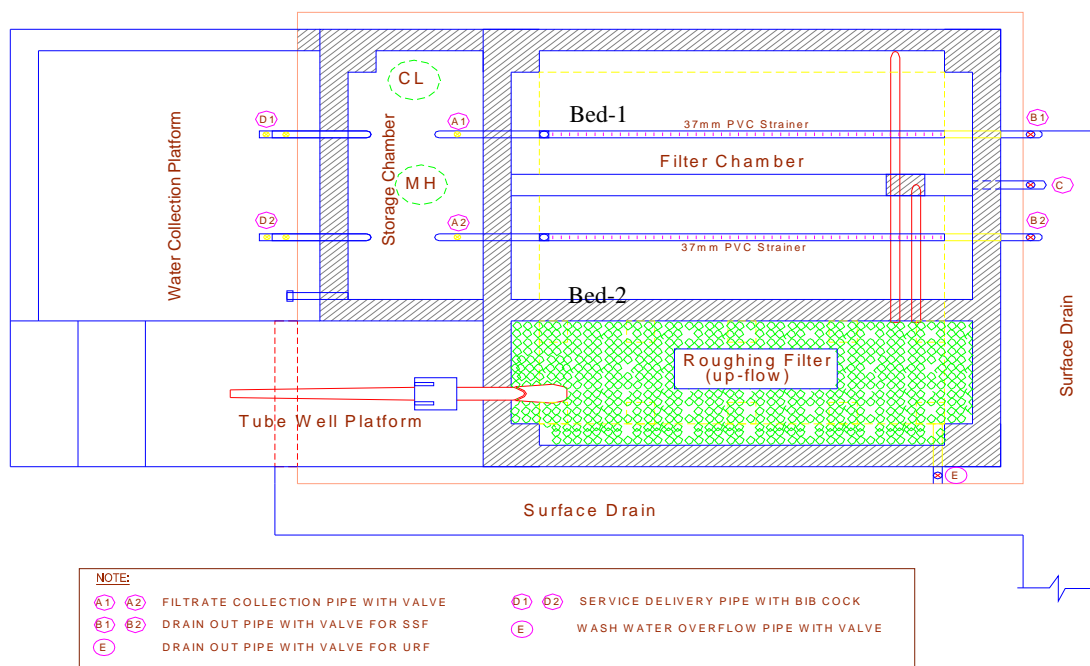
Plan of MSF Plant Showing Different Pipes with Connecting Valves
